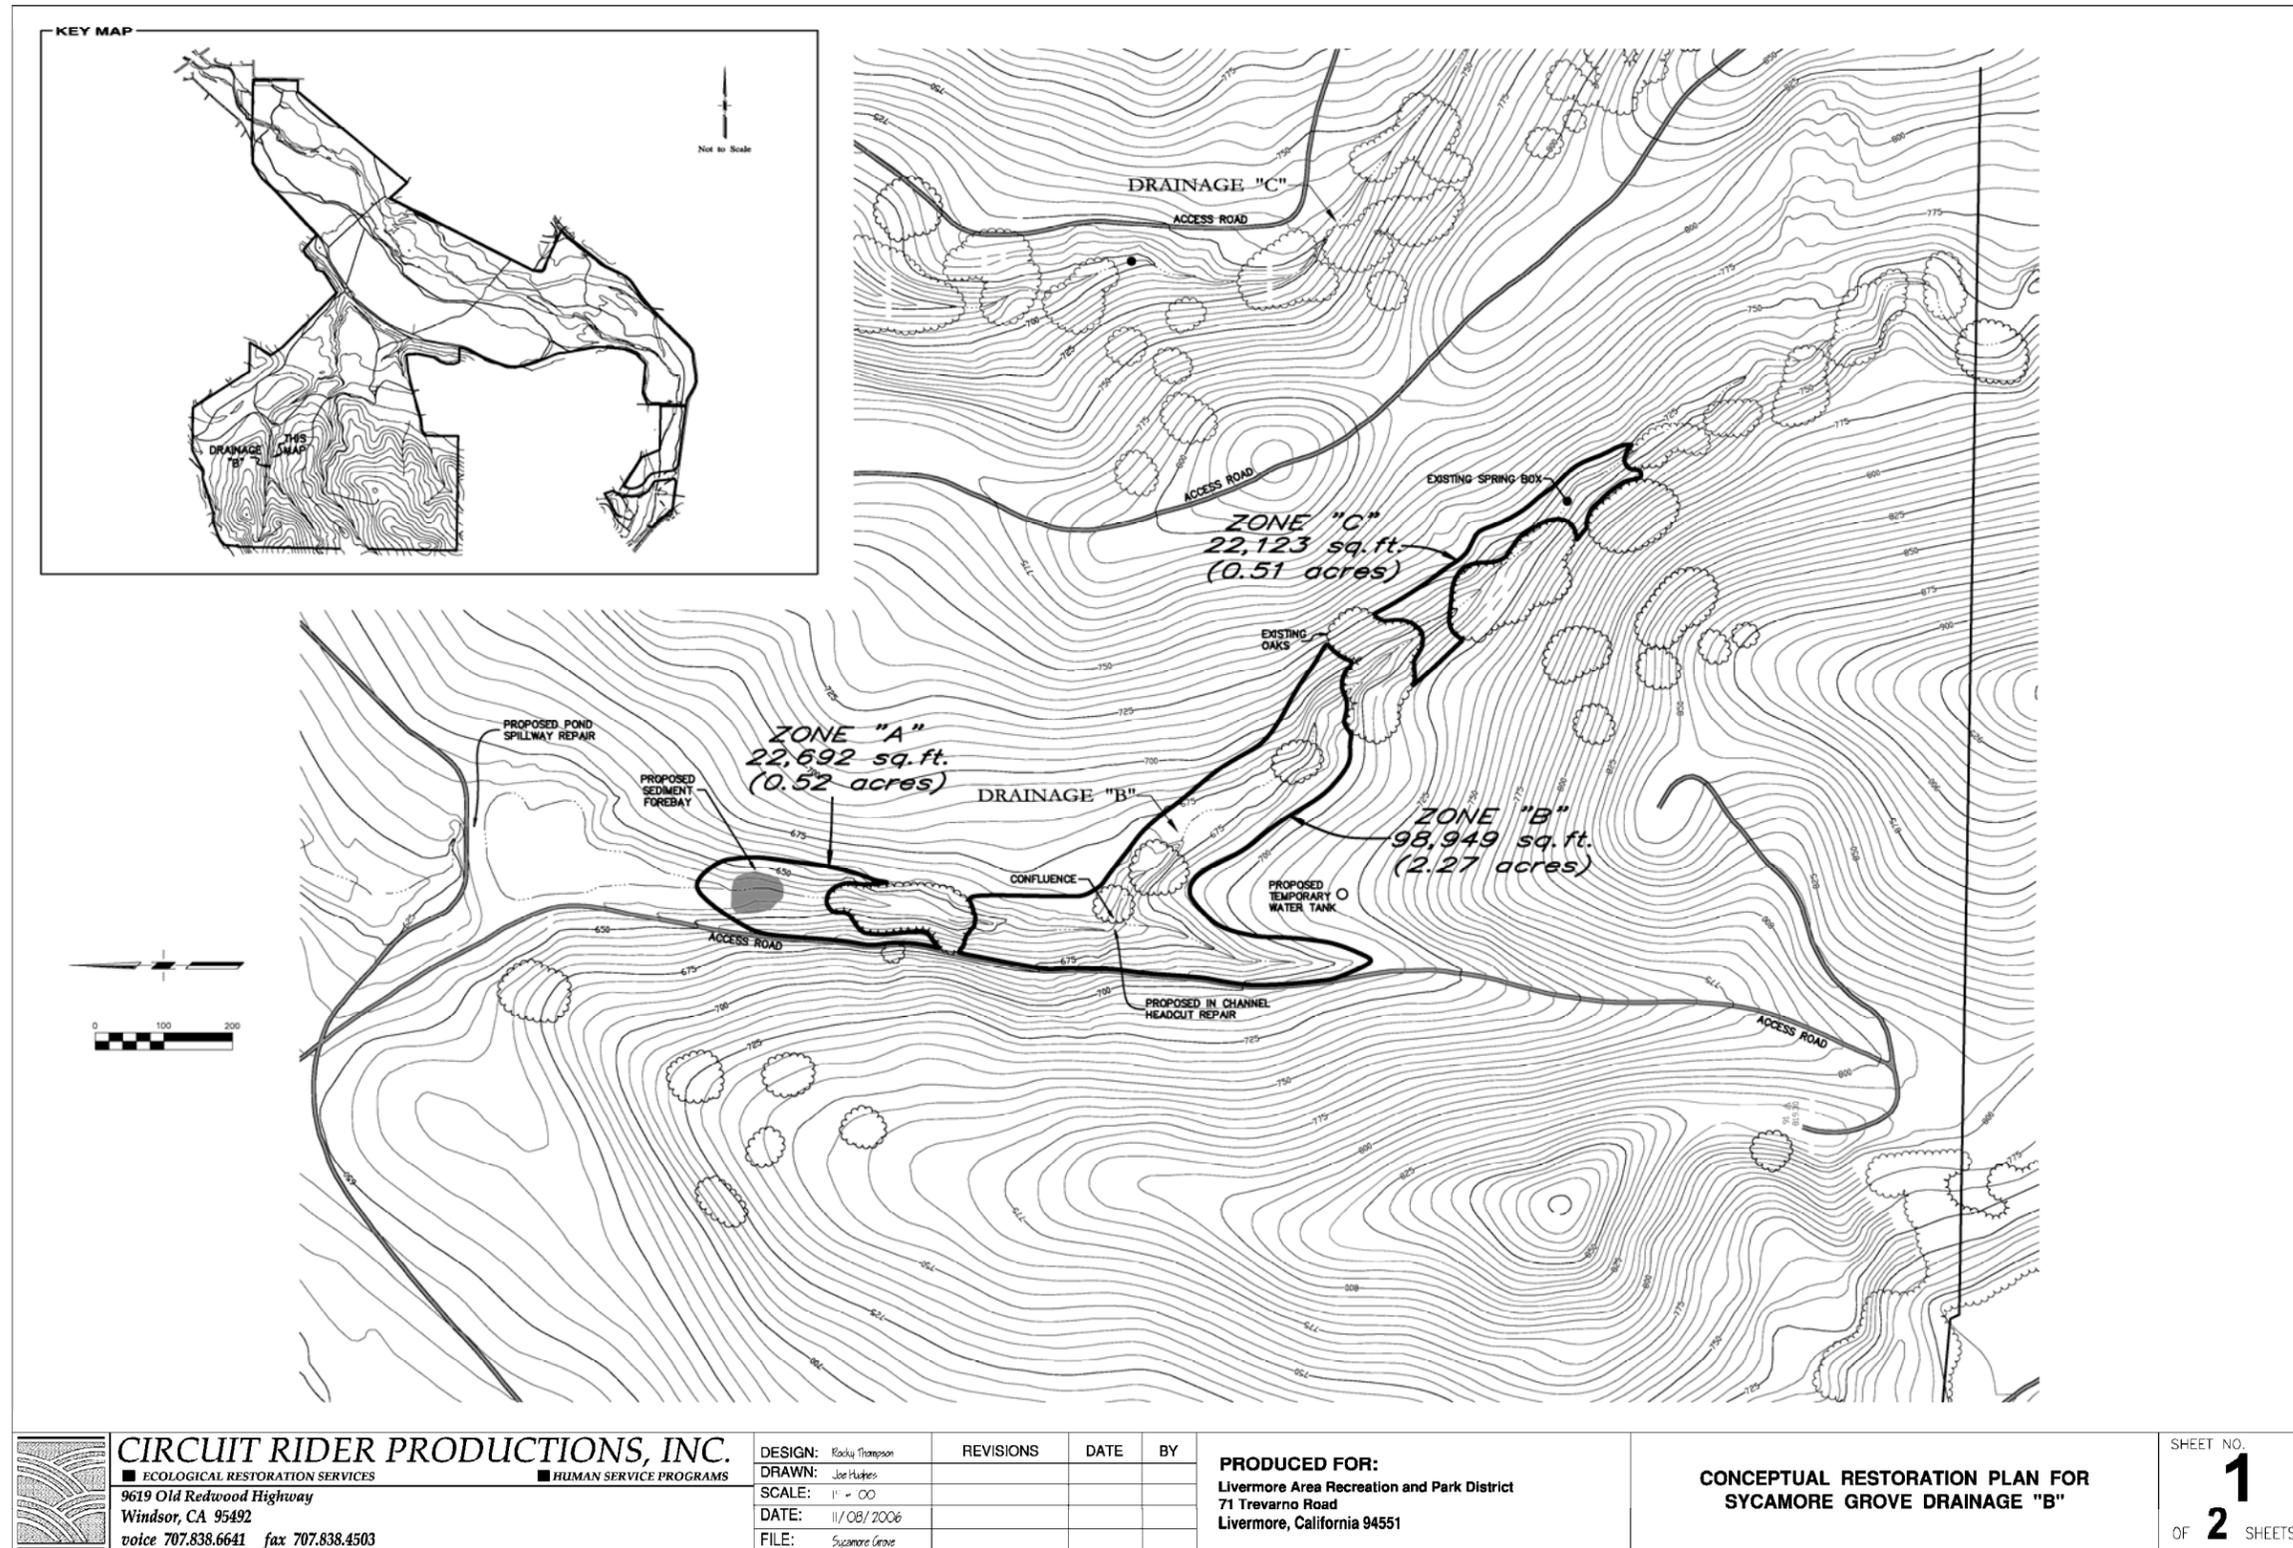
Conceptual Restoration Plan for Upper Drainage B (Sheet 1 of 2)
